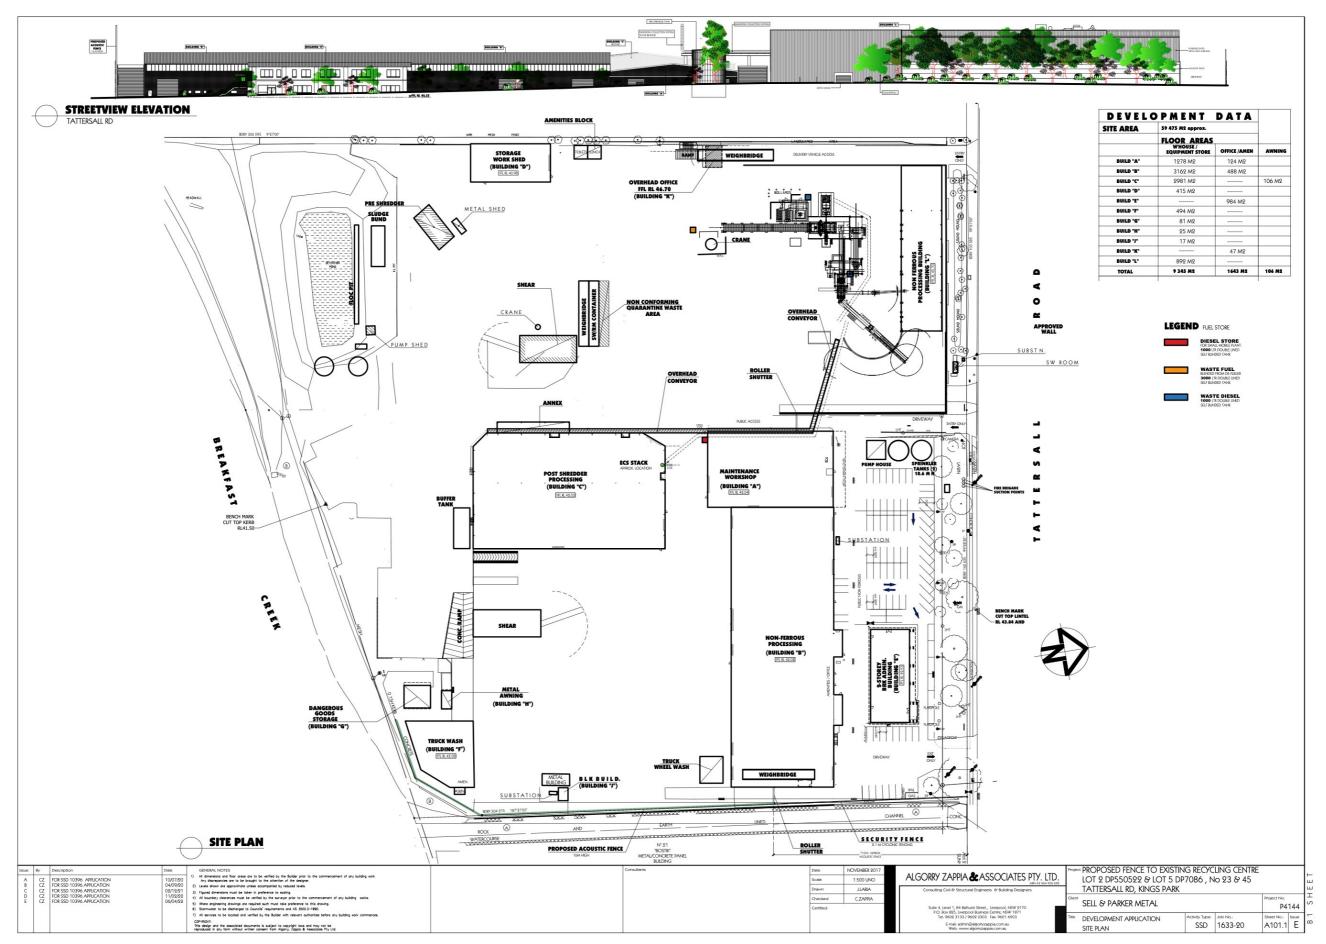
Plan of overall Proposal site showing proposed acoustic wall (indicated by green line)
